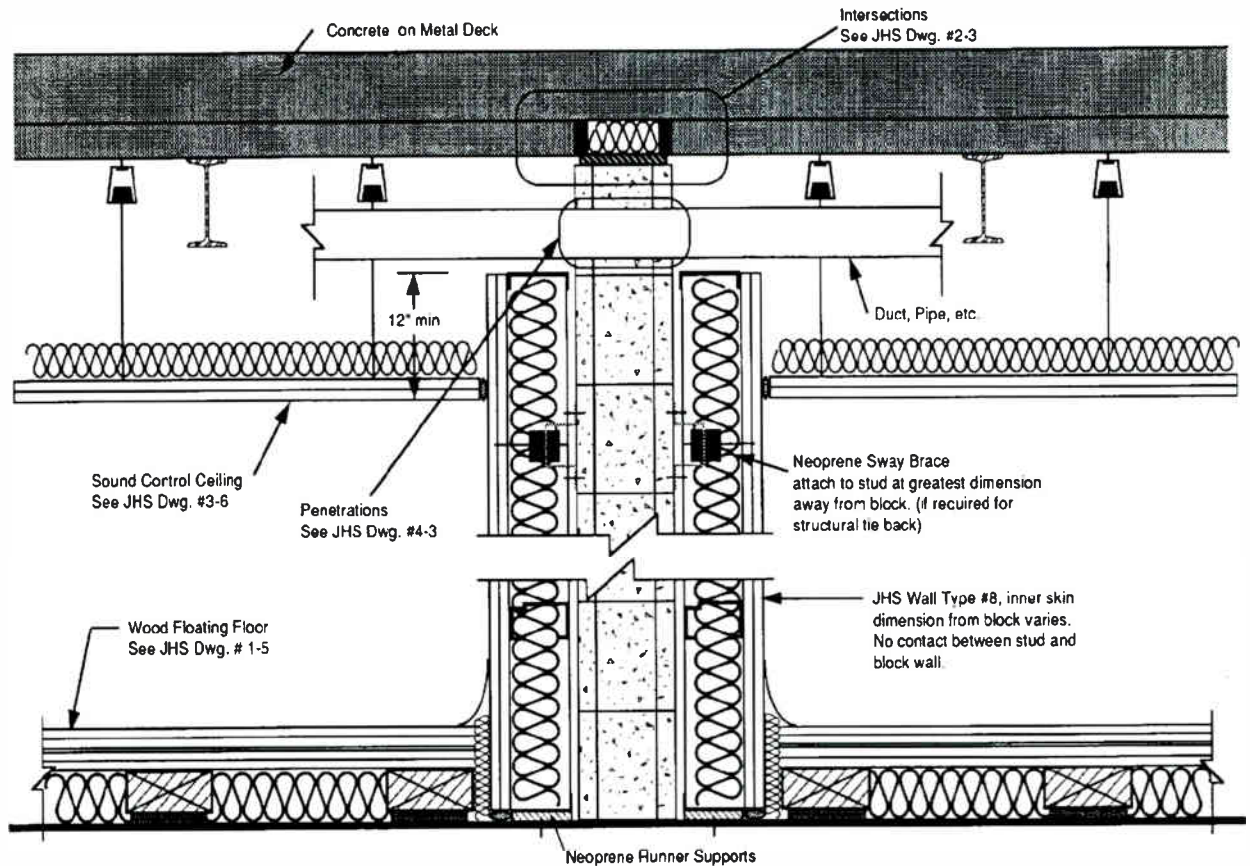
Details of the common music practice room showing both the isolation floor and ceiling interface.
